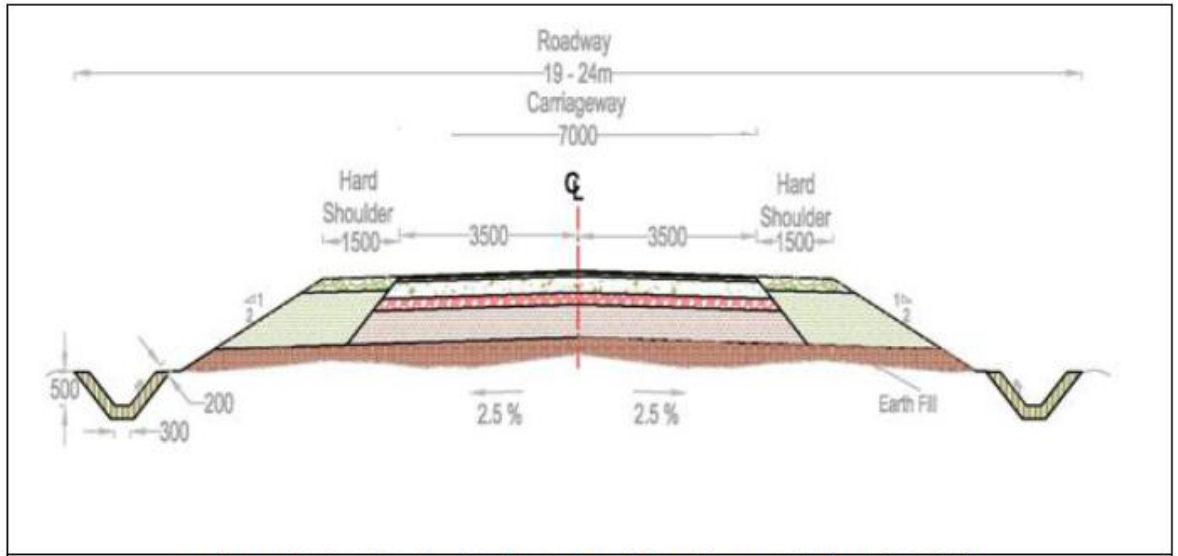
TCS for Project Road Section on Ridge (TCS II)\
